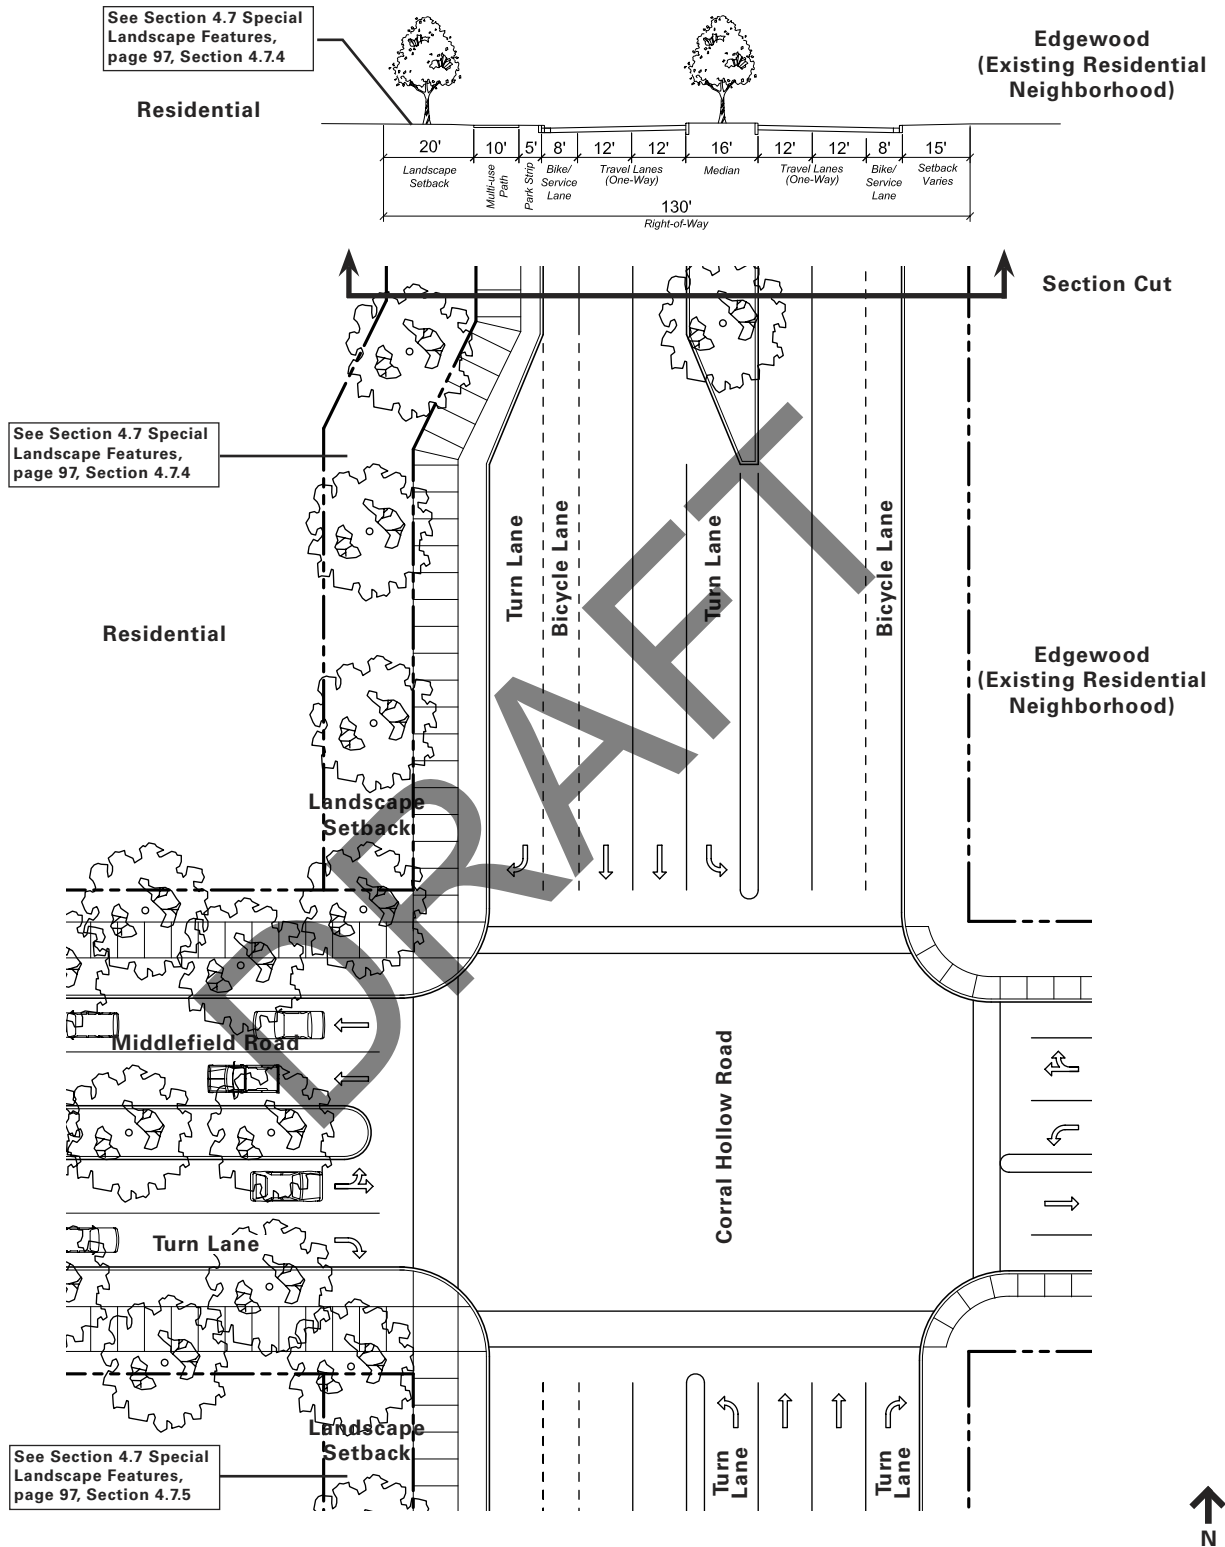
Interim Section and Plan: Regional Arterial – Corral Hollow Road, Designation B (Interim Condition)
